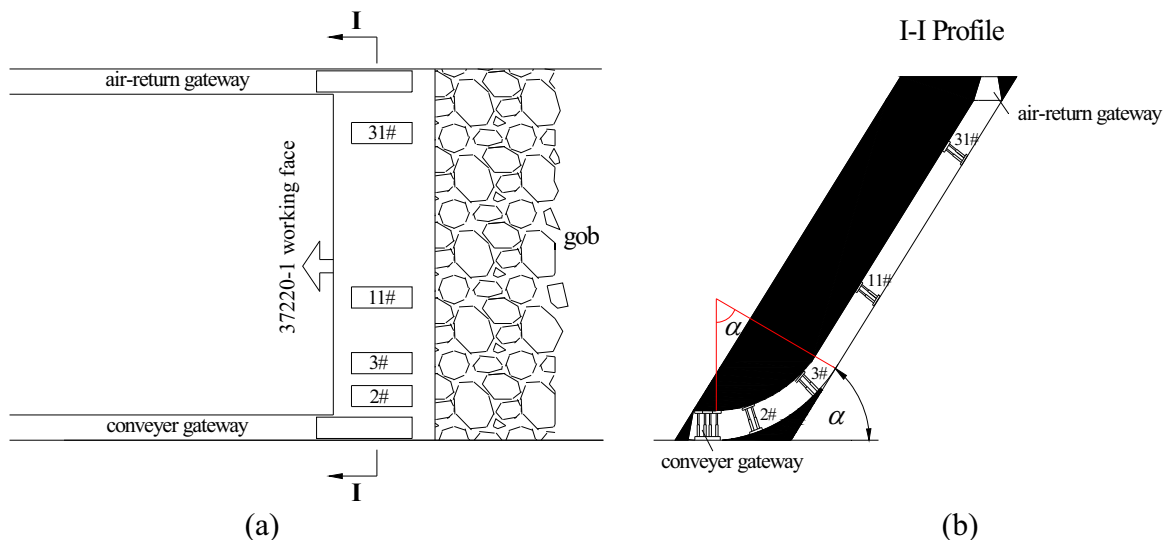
Layout of the working face (a) On coal seam plane; (b) On inclination profile.
